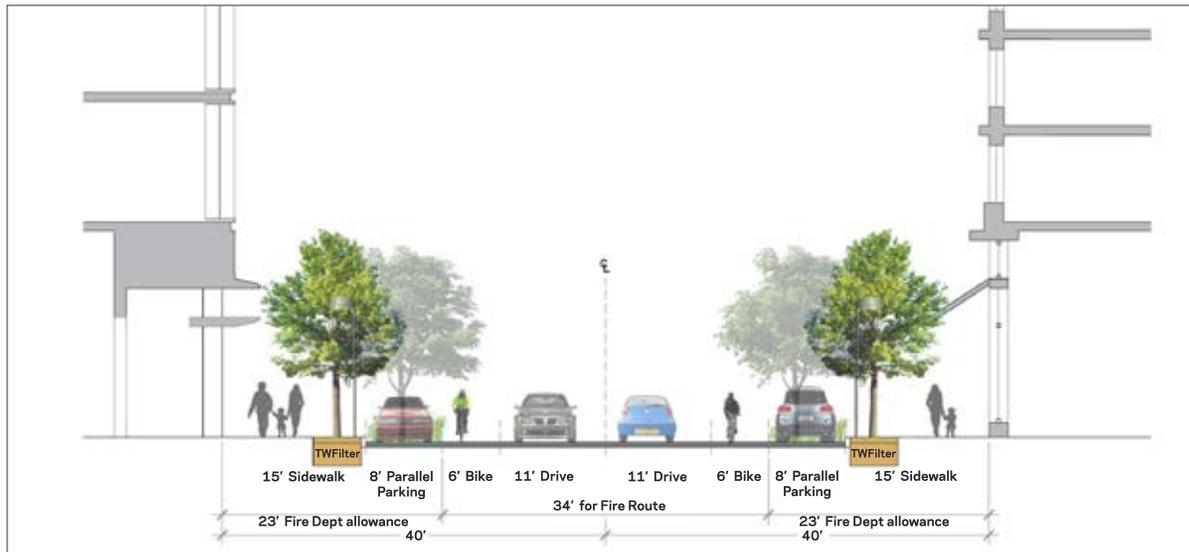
State Street: Capitol Ave. to Beacon Ave. - Street Section
